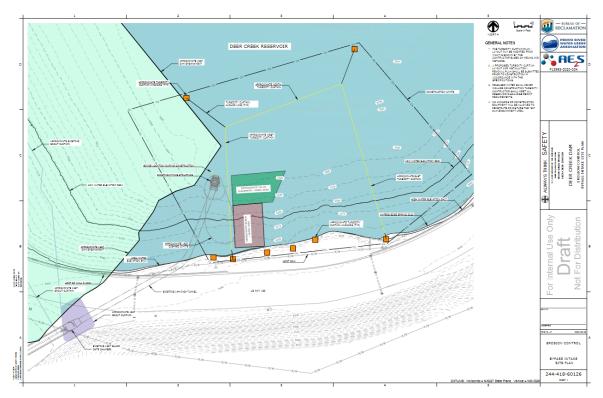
Drawing of Anchoring Plan for Open Water Work, Turbidity Curtain in Yellow
